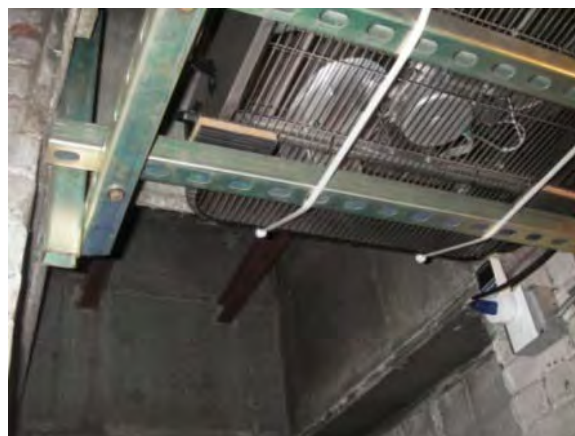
1902 BUILDING RETAIL FAN ADDED UNDER PASSIVE STEAM PIPING
